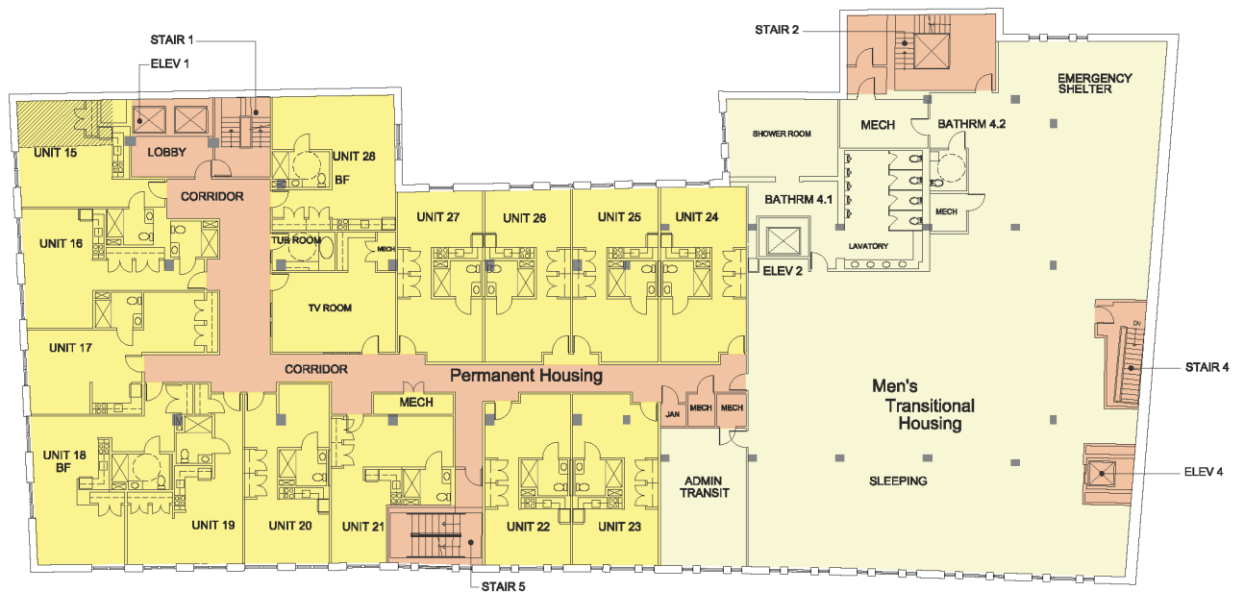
Third & Fourth Floor Transitional Housing /OBR Apartment Layouts
